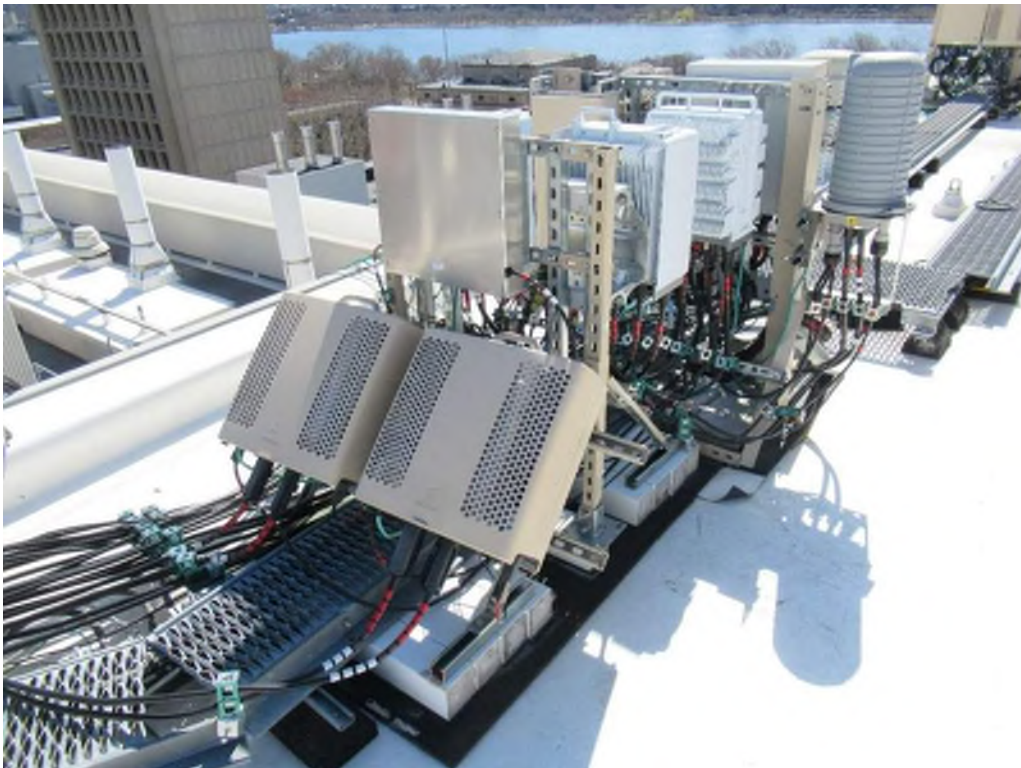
Sample photo illustrating existing RRH ballast sleds.
